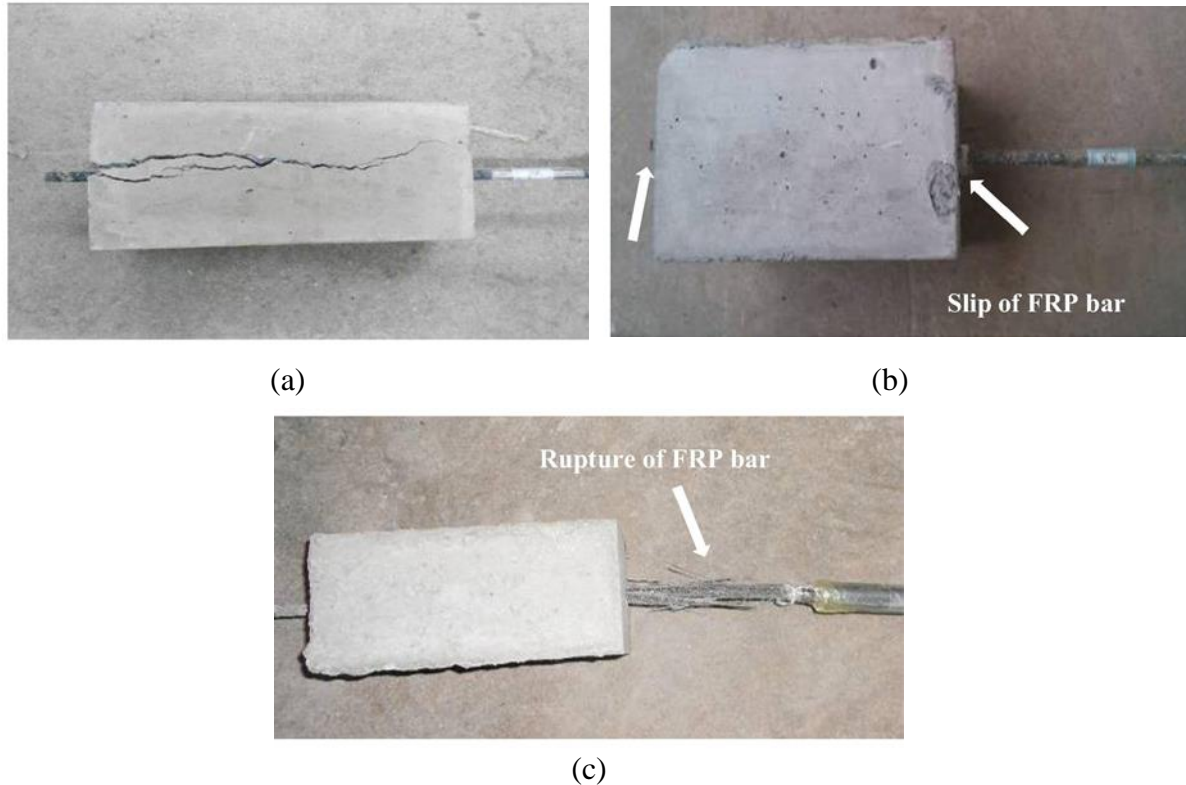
Failure modes of specimens during pull-out test: (a) concrete splitting; (b) bar pull-out; (c) bar rupture (Li et al., 2017).
